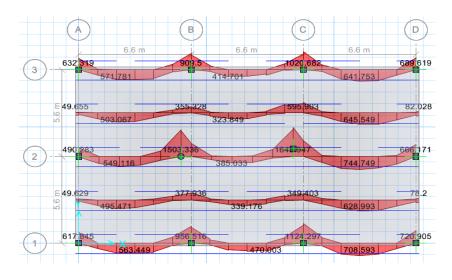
Along longer side reinforcement(SAFE:BS, with staggered column)
